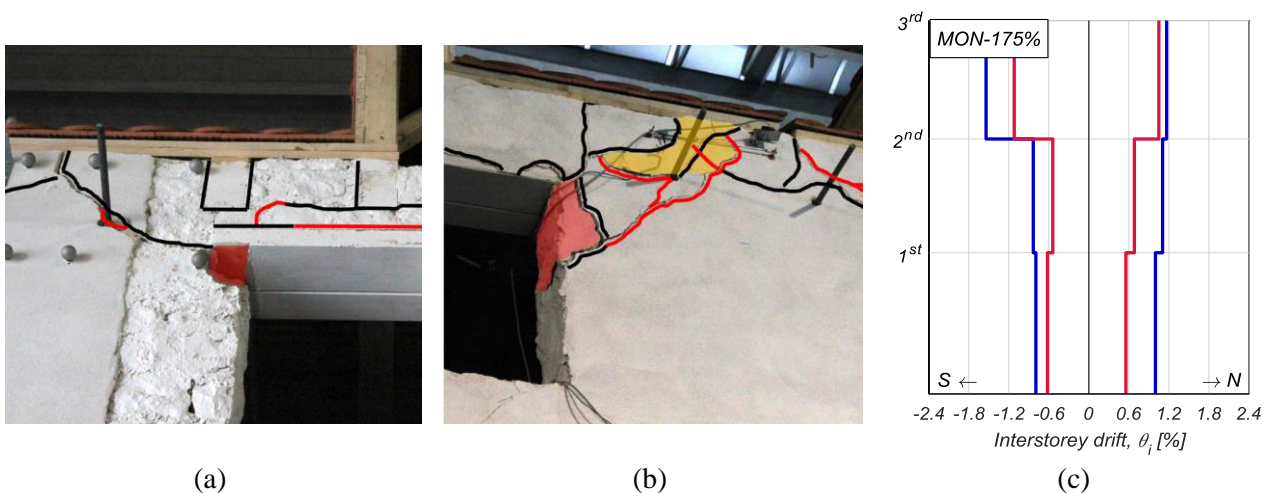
Test results after MON-175% with PGA of 0.347 g: (a) West wall fallen stone; (b) East wall completely detached stones and plaster; (c) interstorey drift envelopes, West wall in blue and East wall in red.
